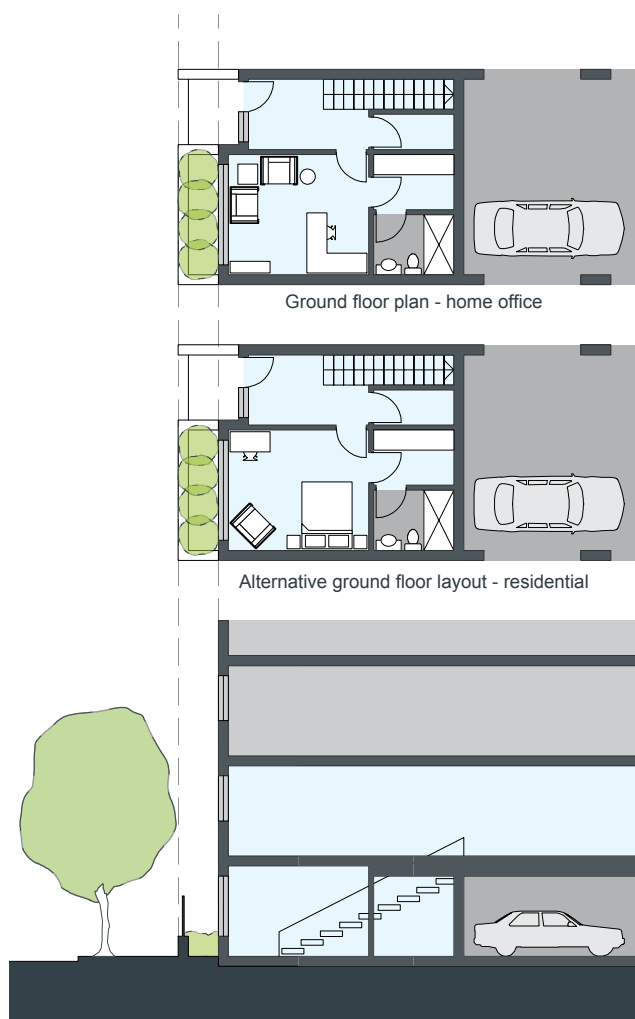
L.3 Plan and section of a double storey apartment which is directly accessible from the street
